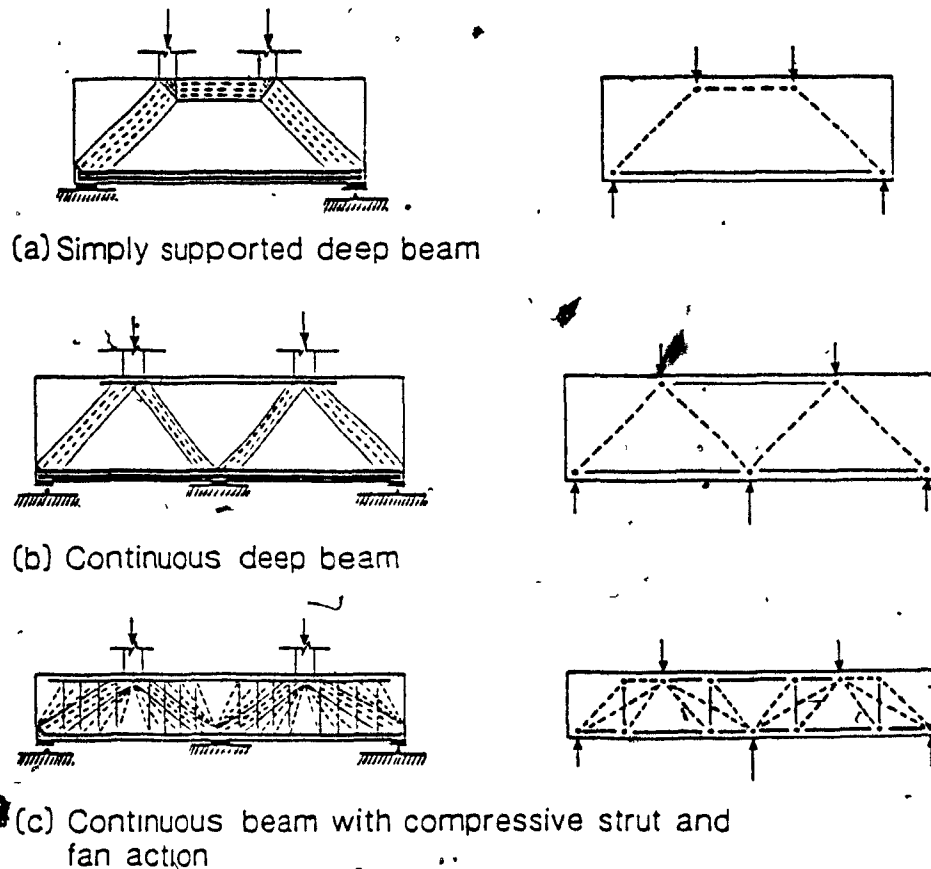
Strut and Tie Models and Truss Idealizations for Deep Beams.
